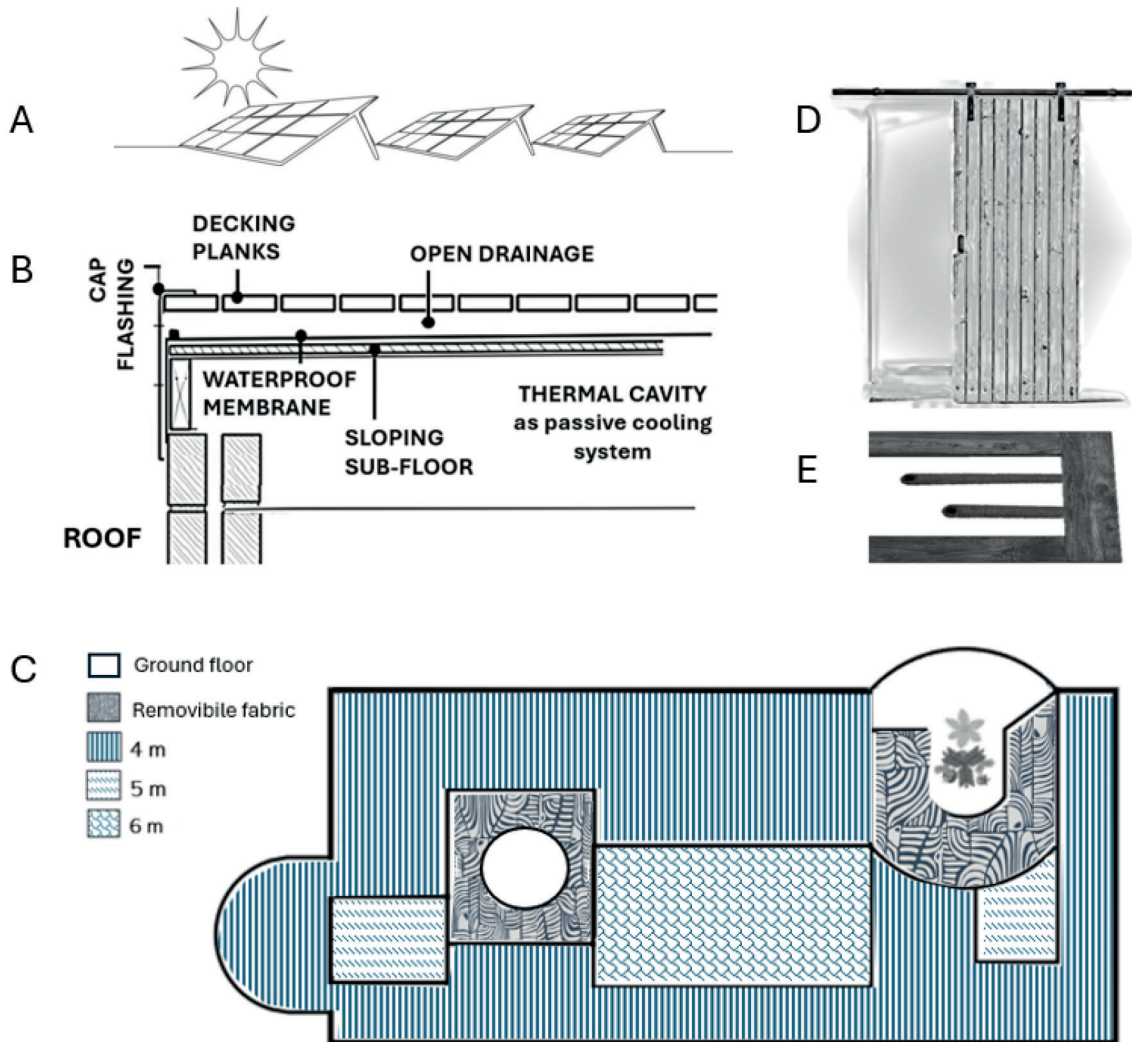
Construction Technical Details. A) Provision for the installation of solar panels on the roof, B) construction technical details for the roof, C) elevation of the building's roofs, D) Construction Technical Details for doors – The sliding doors will be crafted from high-quality wood to ensure durability and aesthetic appeal. These doors will feature an ergonomic design that allows for quick and easy access, reducing the need for contact with handles and thereby minimizing the risk of environmental microbial contamination within the healthcare space. The doors will be installed using an external track and trolley system, allowing for smooth and efficient operation. The track will be securely mounted to the wall, and the trolley system will consist of robust metal components designed to support the weight of the doors while allowing for effortless sliding, E) The windows will feature frames made from wooden planks, providing a sturdy structure. Dividers will be constructed using bamboo slats, which will allow for natural light and ventilation while offering partial light shielding. This combination of materials will enhance the windows' aesthetic appeal and contribute to the overall sustainability of the building design.
